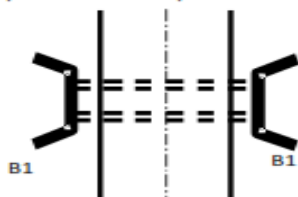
CULVERT ENTRY / EXIT STRUCTURE TYPES
